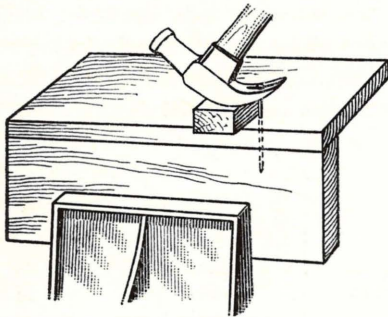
A block should be used under the head of the hammer when pulling a nail
